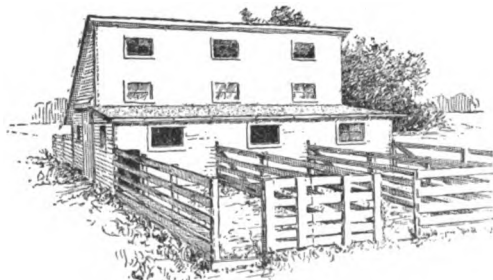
Exterior view of a section of the hoghouse at the Illinois Experiment Station, showing low flat roof on south side of building and the placing of windows and ventilators.
